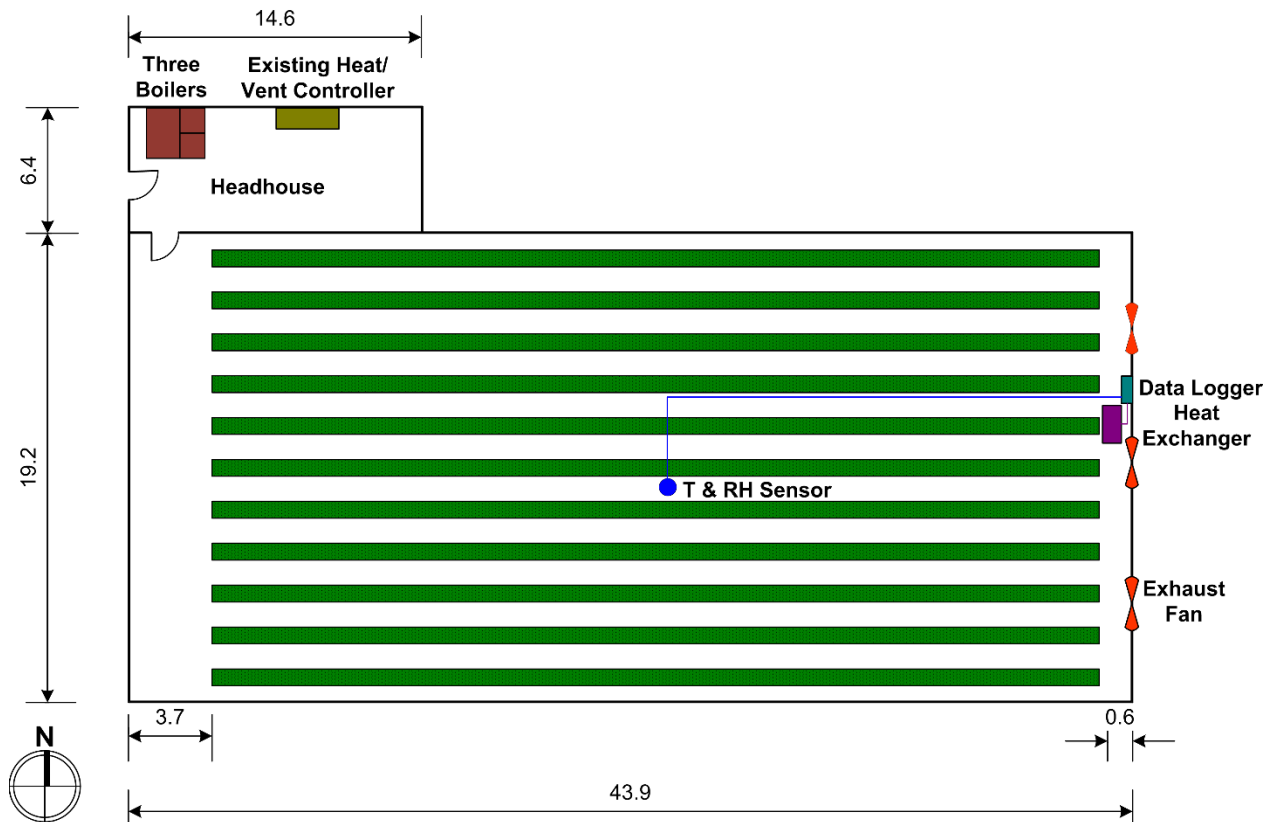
Sketch of the greenhouse layout and measurement position (dimensions in m).
